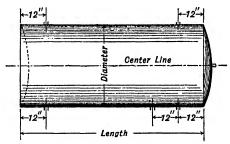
Standard Location of Openings for Hot Water Storage Tanks.
